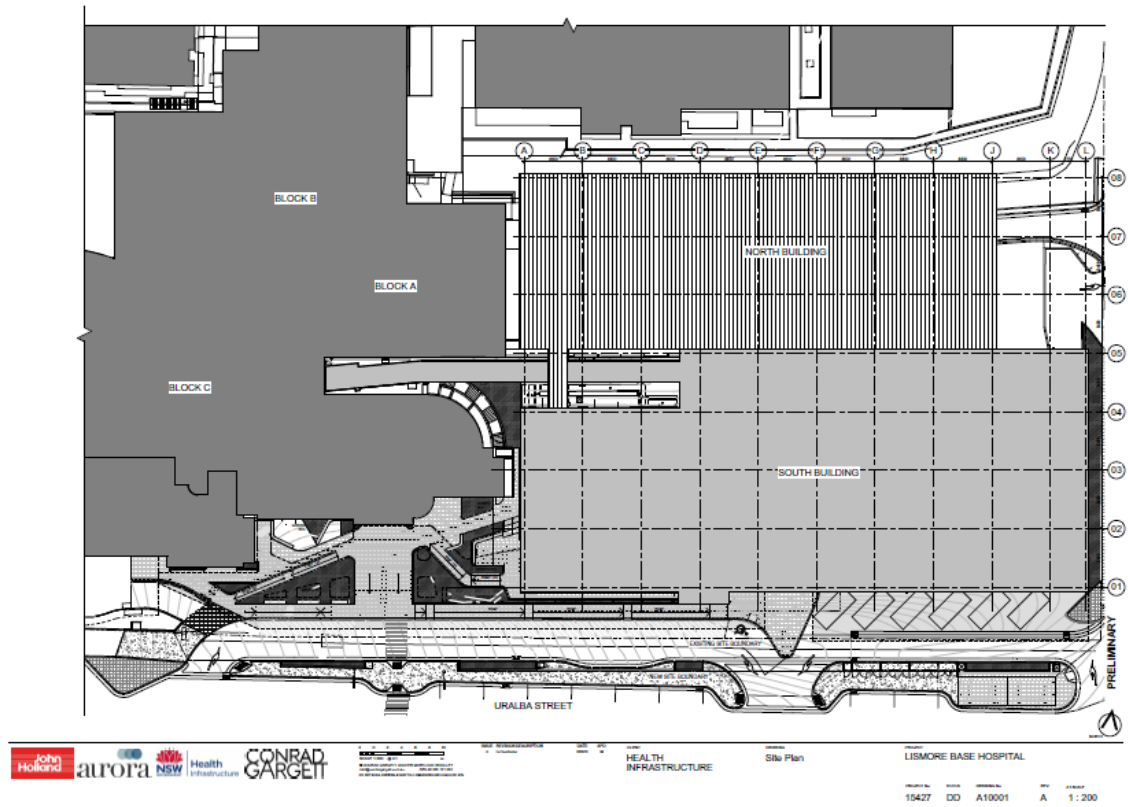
Overlay of Stage 3B1 South Tower and 3B North Tower Buildings
